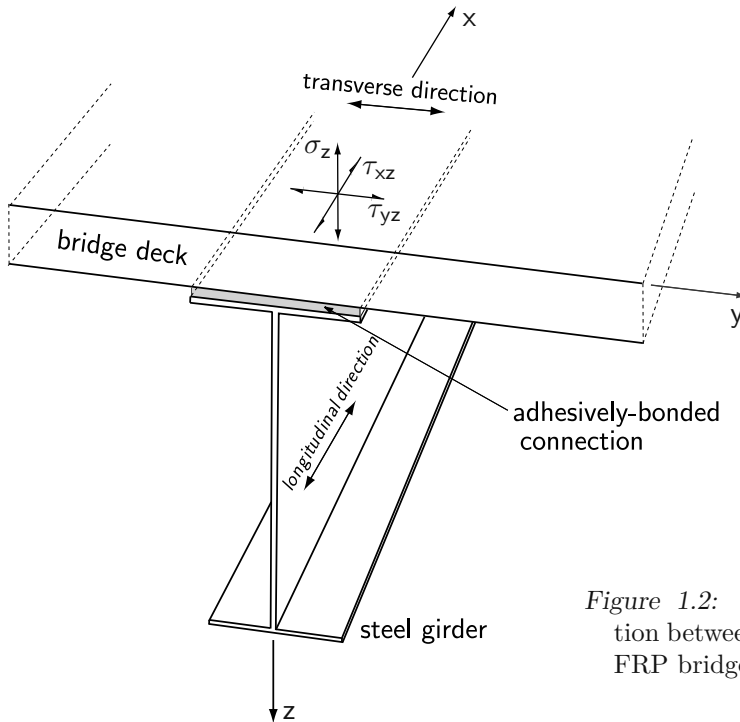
Adhesively-bonded connection between steel girder and pultruded FRP bridge deck
